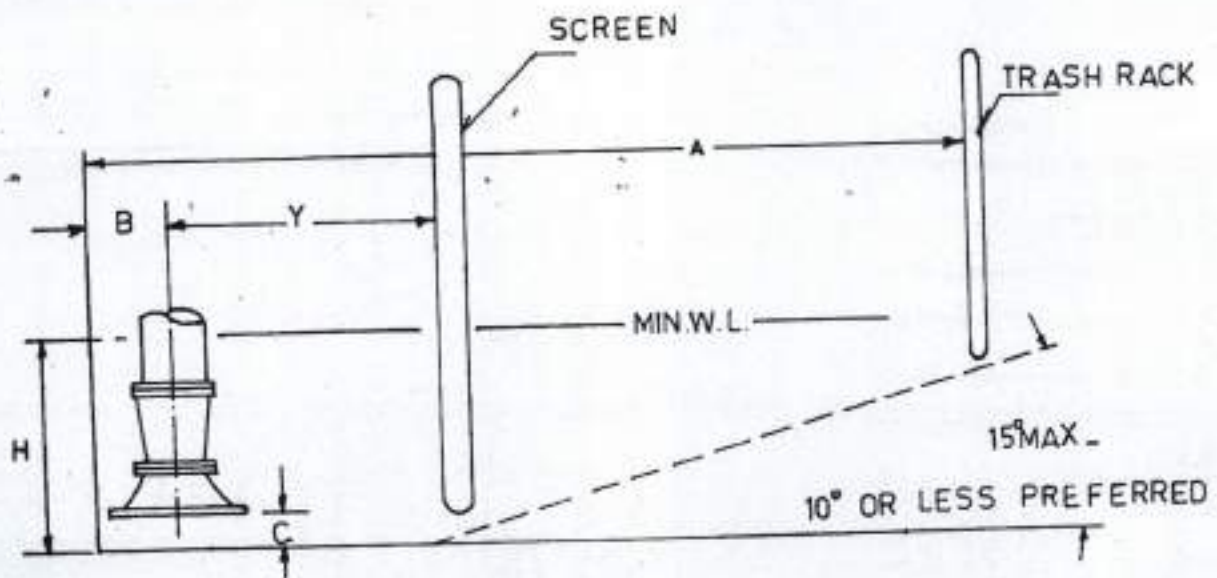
SUMP DIMENSIONS ELEVATION VIEW
